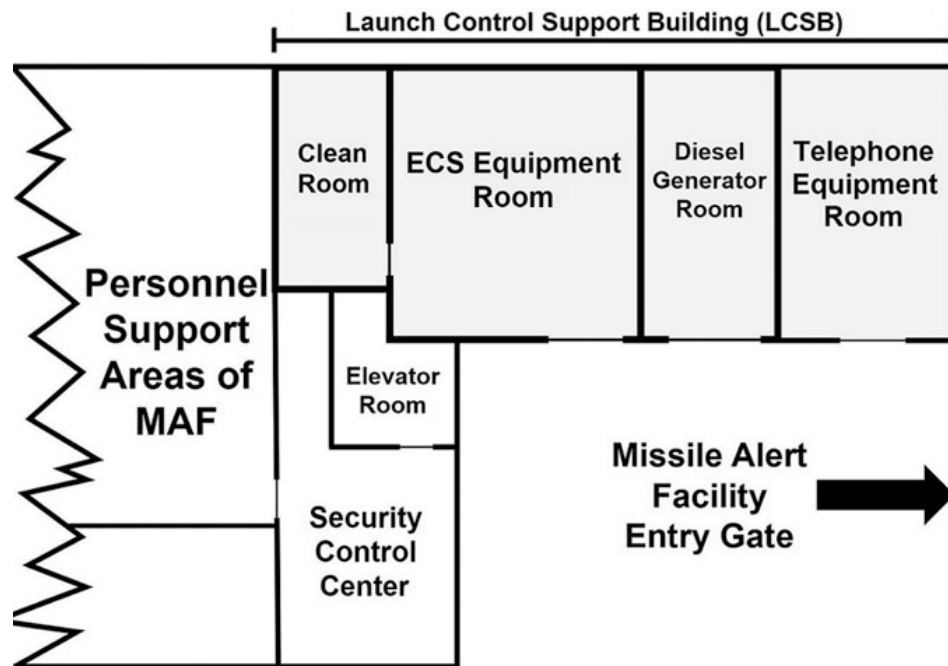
Top-down view of a Wing 1 launch control support building.
